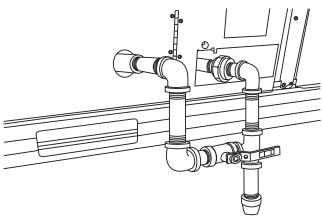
Gas Piping, Typical Curb Sidewall Piping (Example 2)
